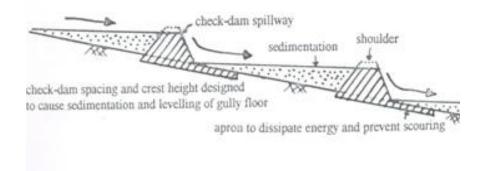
Determination of check dams spacing and the layout Source: http://www.fao.org
